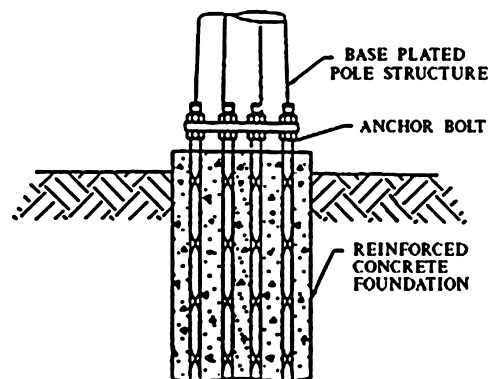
DRILLED SHAFT FOUNDATION WITH ANCHOR BOLTS.
